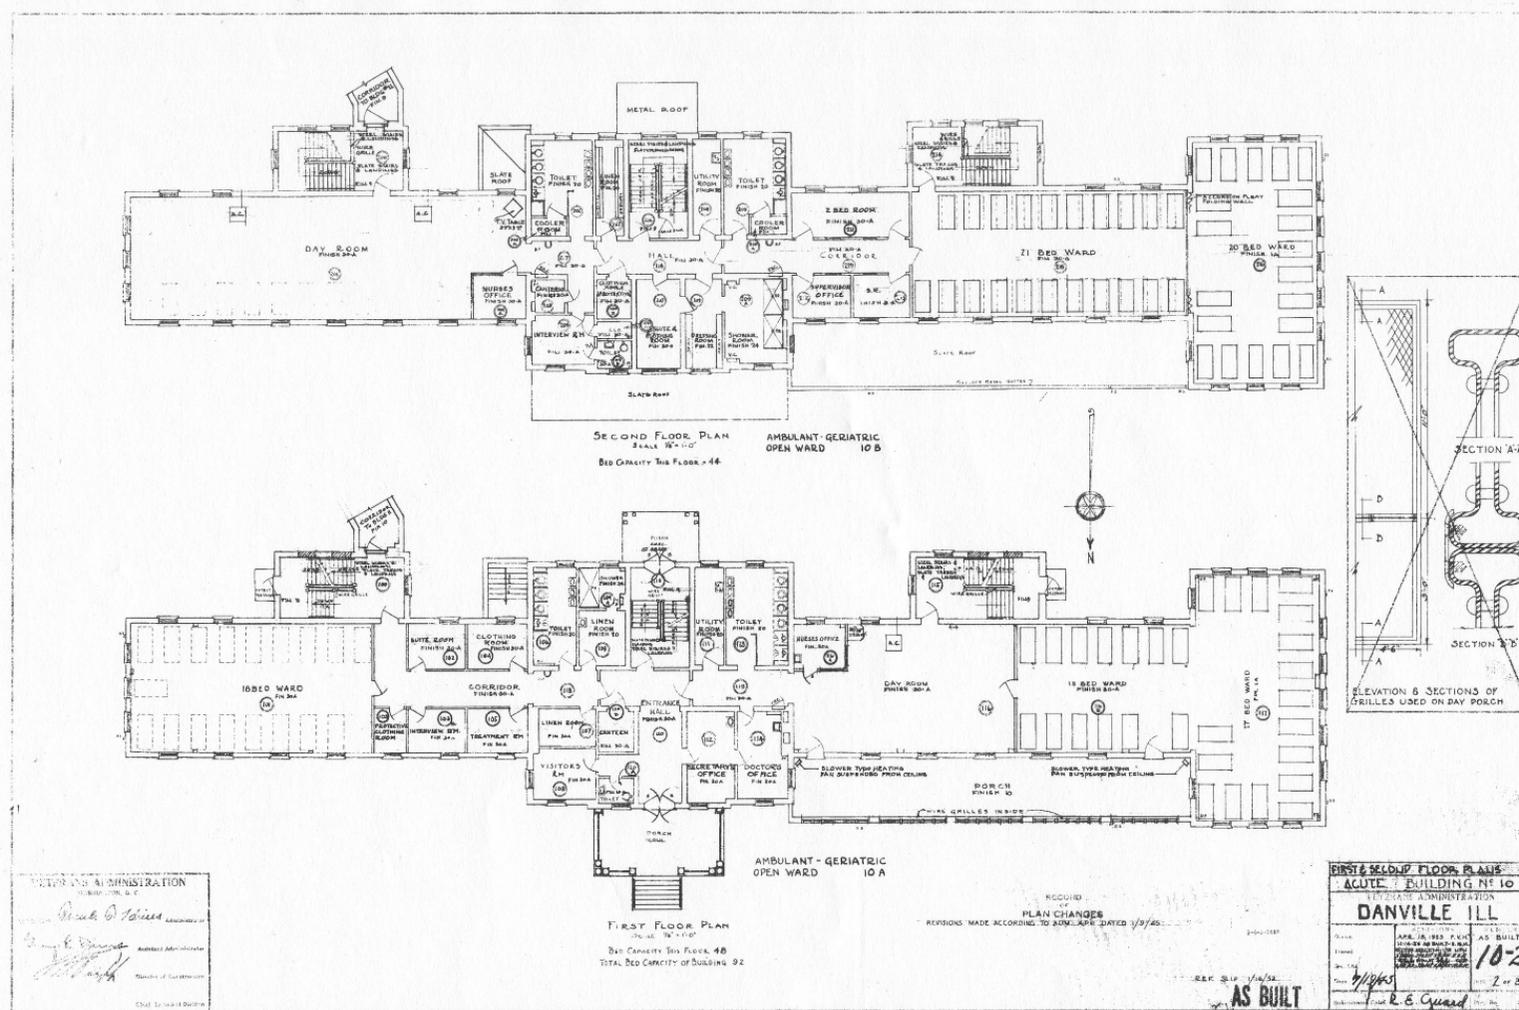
First and second floor plans of Building 10, showing modification undertaken by the VA in 1934 and later.
